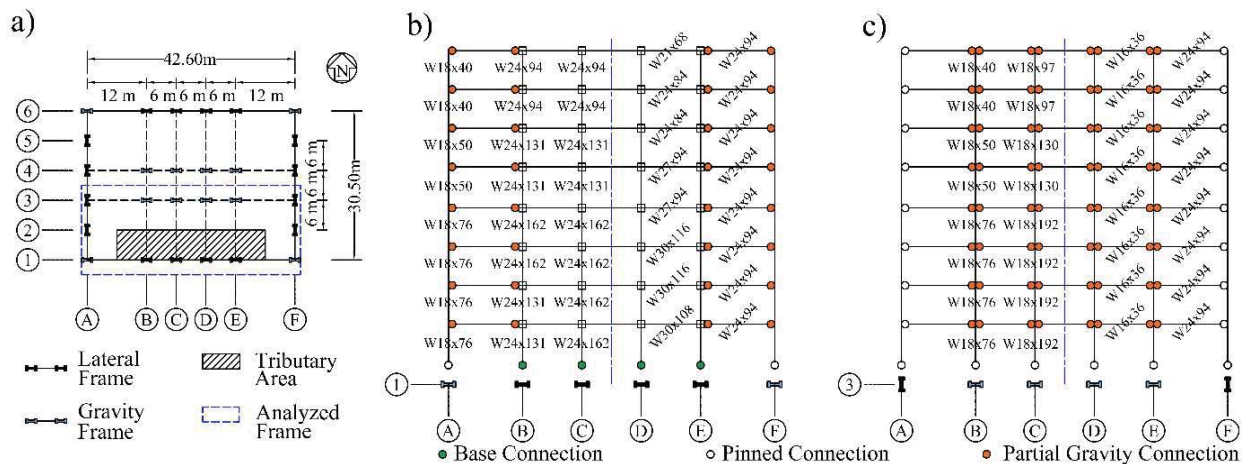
8-story SMF. a) Plan view. b) Elevation view axis 1. c) Elevation view axis 3.
